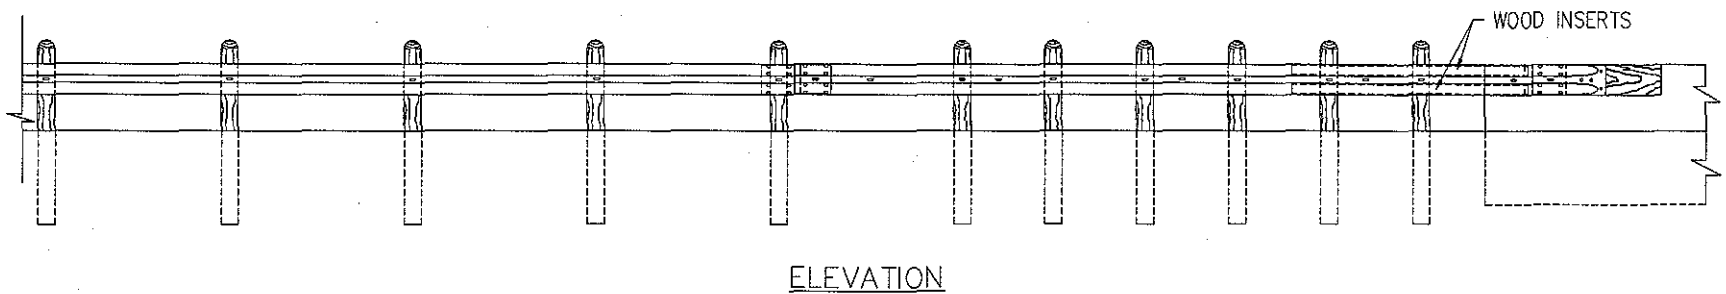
RECOMMENDED RETROFIT TRANSITION DESIGN
